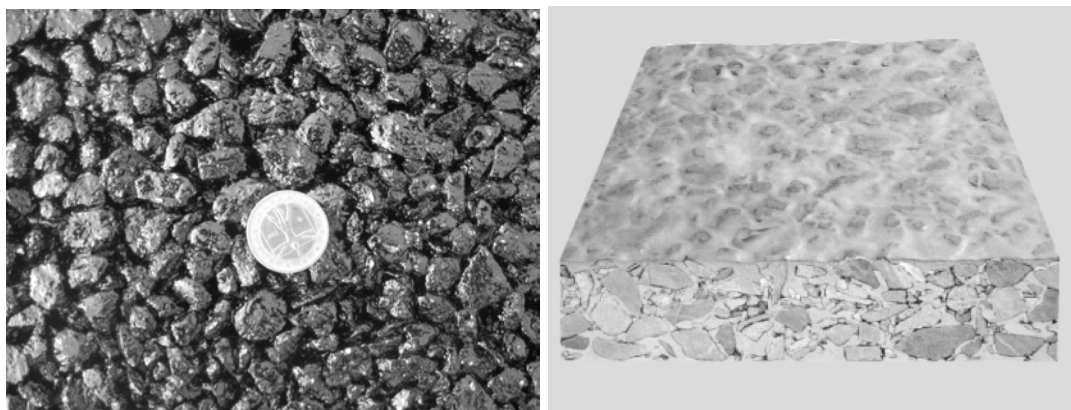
Open-grade asphalt (left) and an example of the pavement obtained (right).
